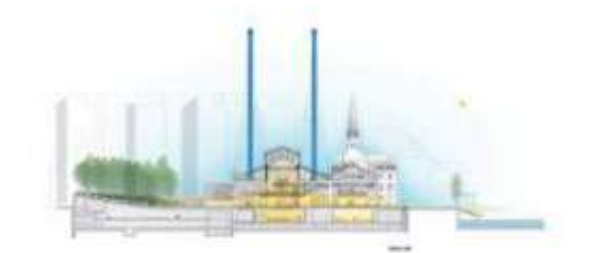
Renzo Piano Building Workshop, GES-2 Art Center in Moscow, 2021, section (archive RPBW).
